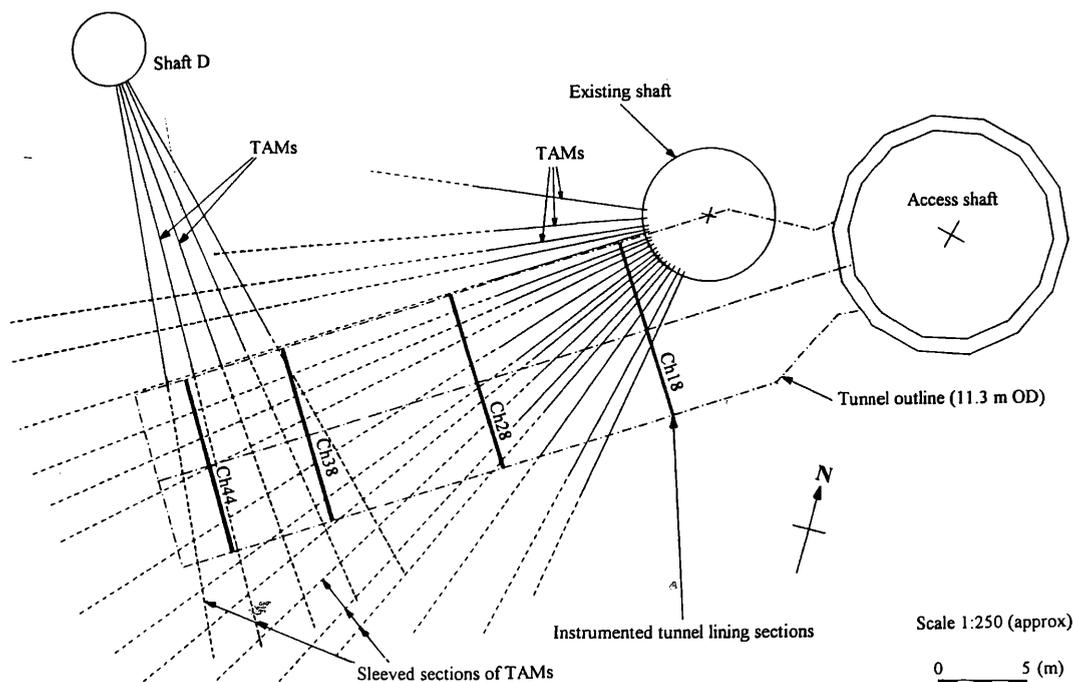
Plan layout of compensation grouting trials at Redcross Way
